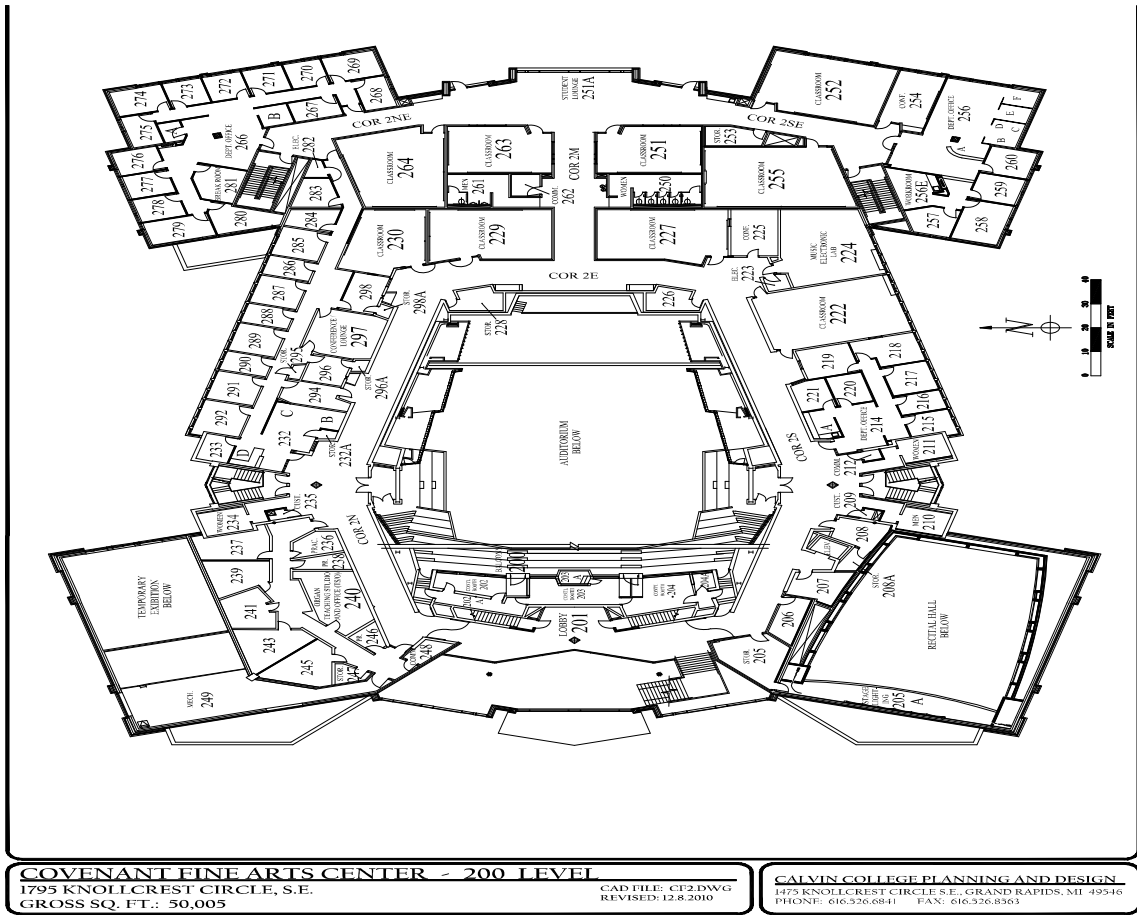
CFAC Upper-Level Floor Plan Rooms 1, 2, 3.
